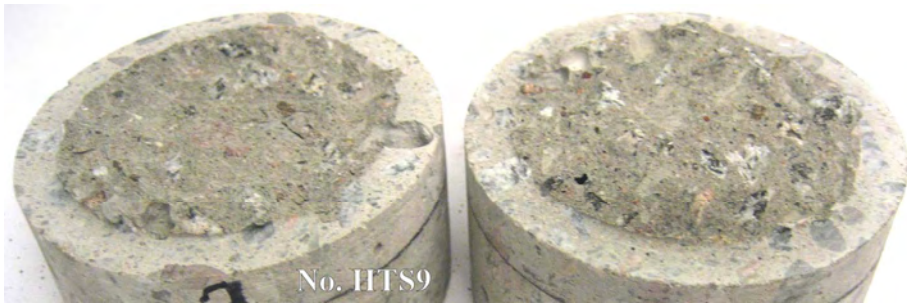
Photograph showing the failure surface for test No. HTS9 after tensile test.
